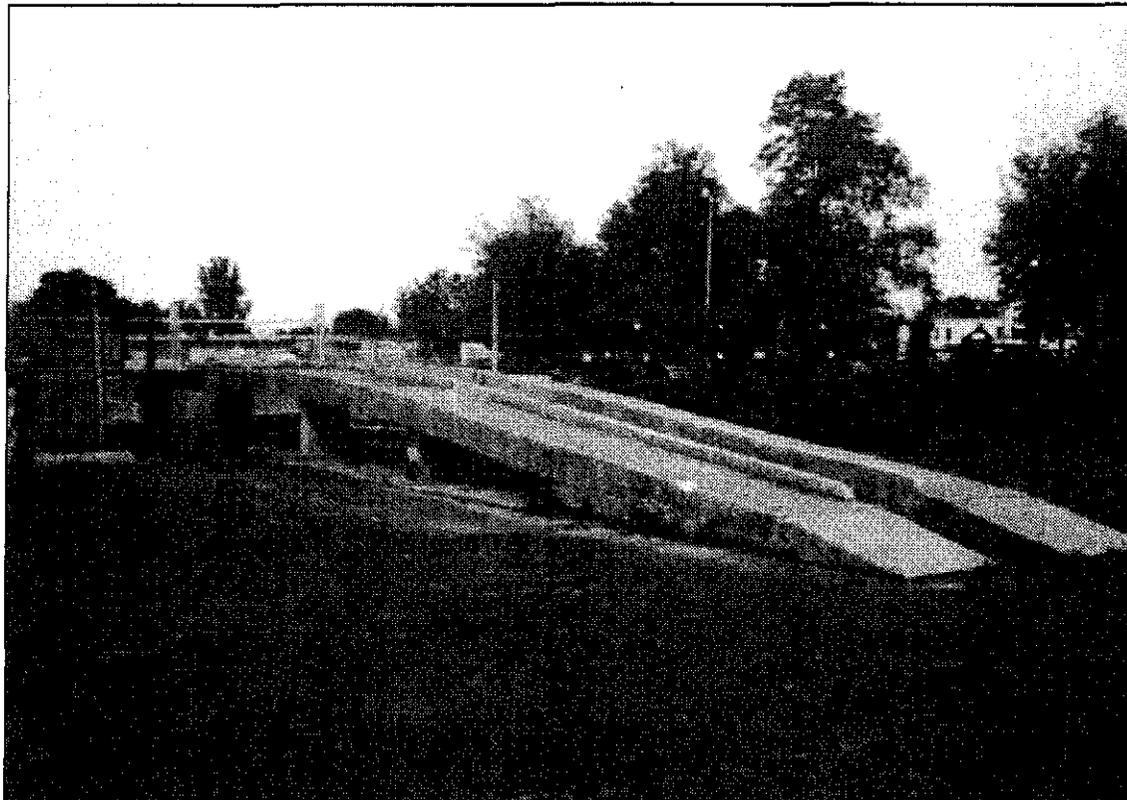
SSG Roy Clifton Scouten USARC Concrete Ramp, facing northeast.
